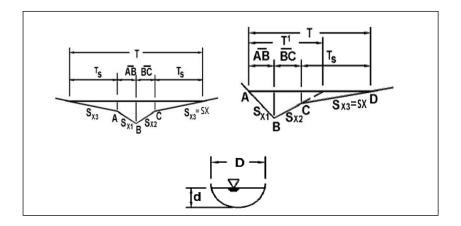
Typical gutter sections Shallow Swale Sections (Brown S.A. et al, 2009).
